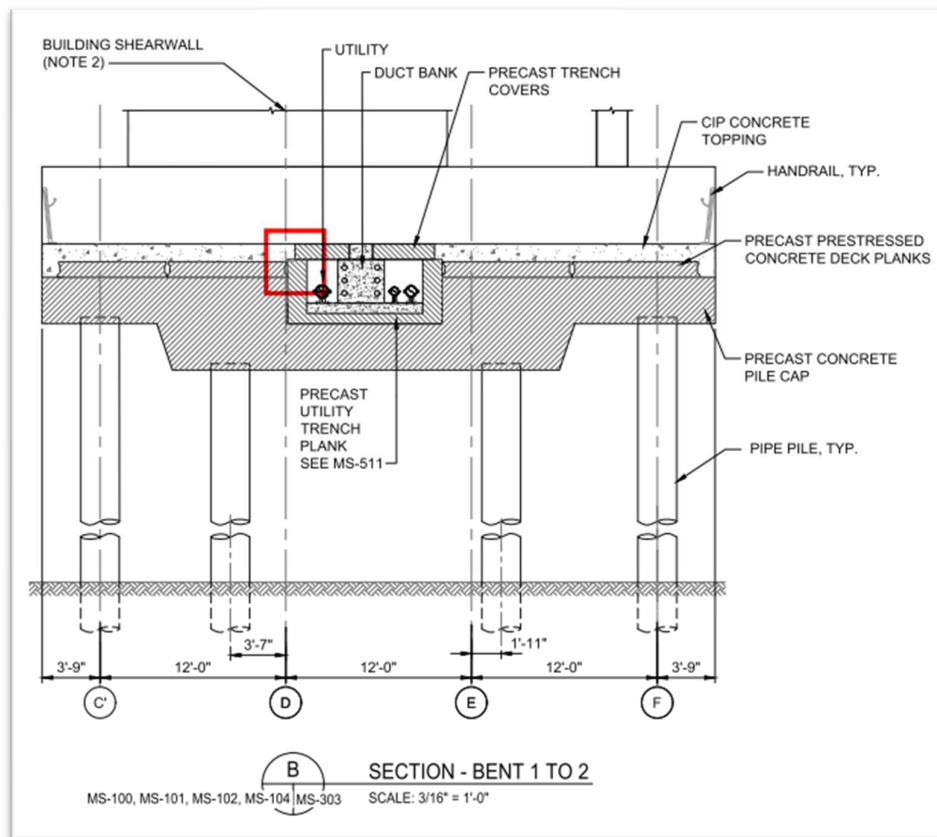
shows the precast pile cap, wall, and deck configuration
